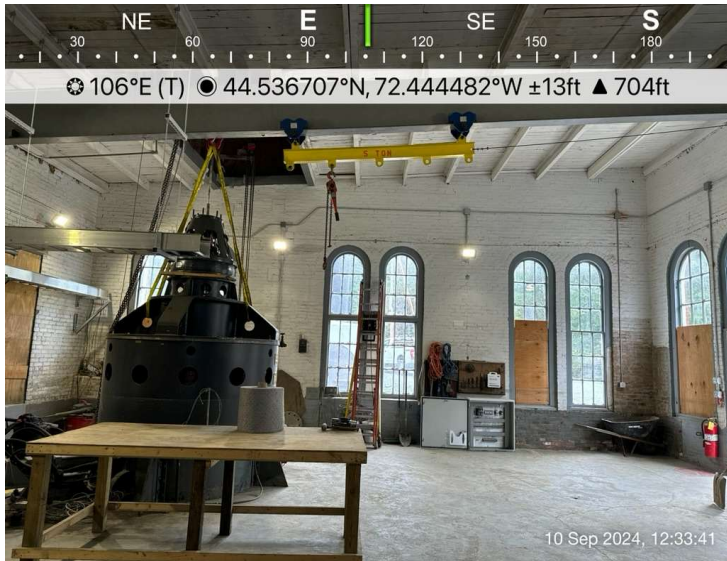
Interior east elevation of facility September 2024 with rebuilt generator installed, not yet operational
